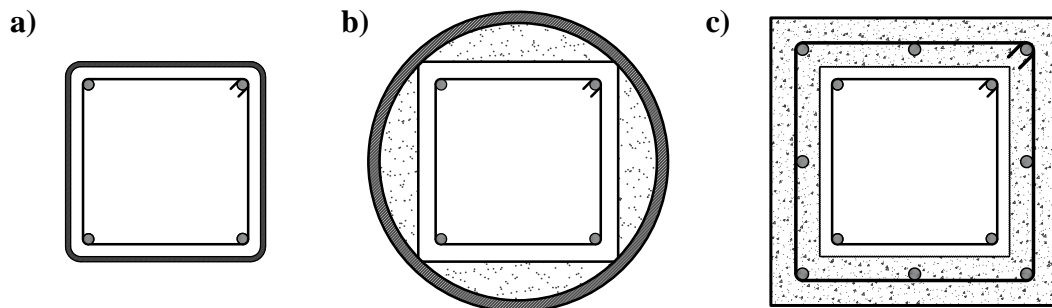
Typical cross-sections of a column retrofitted using (a) FRP; (b) steel jacketing; and (c) RC jacketing
